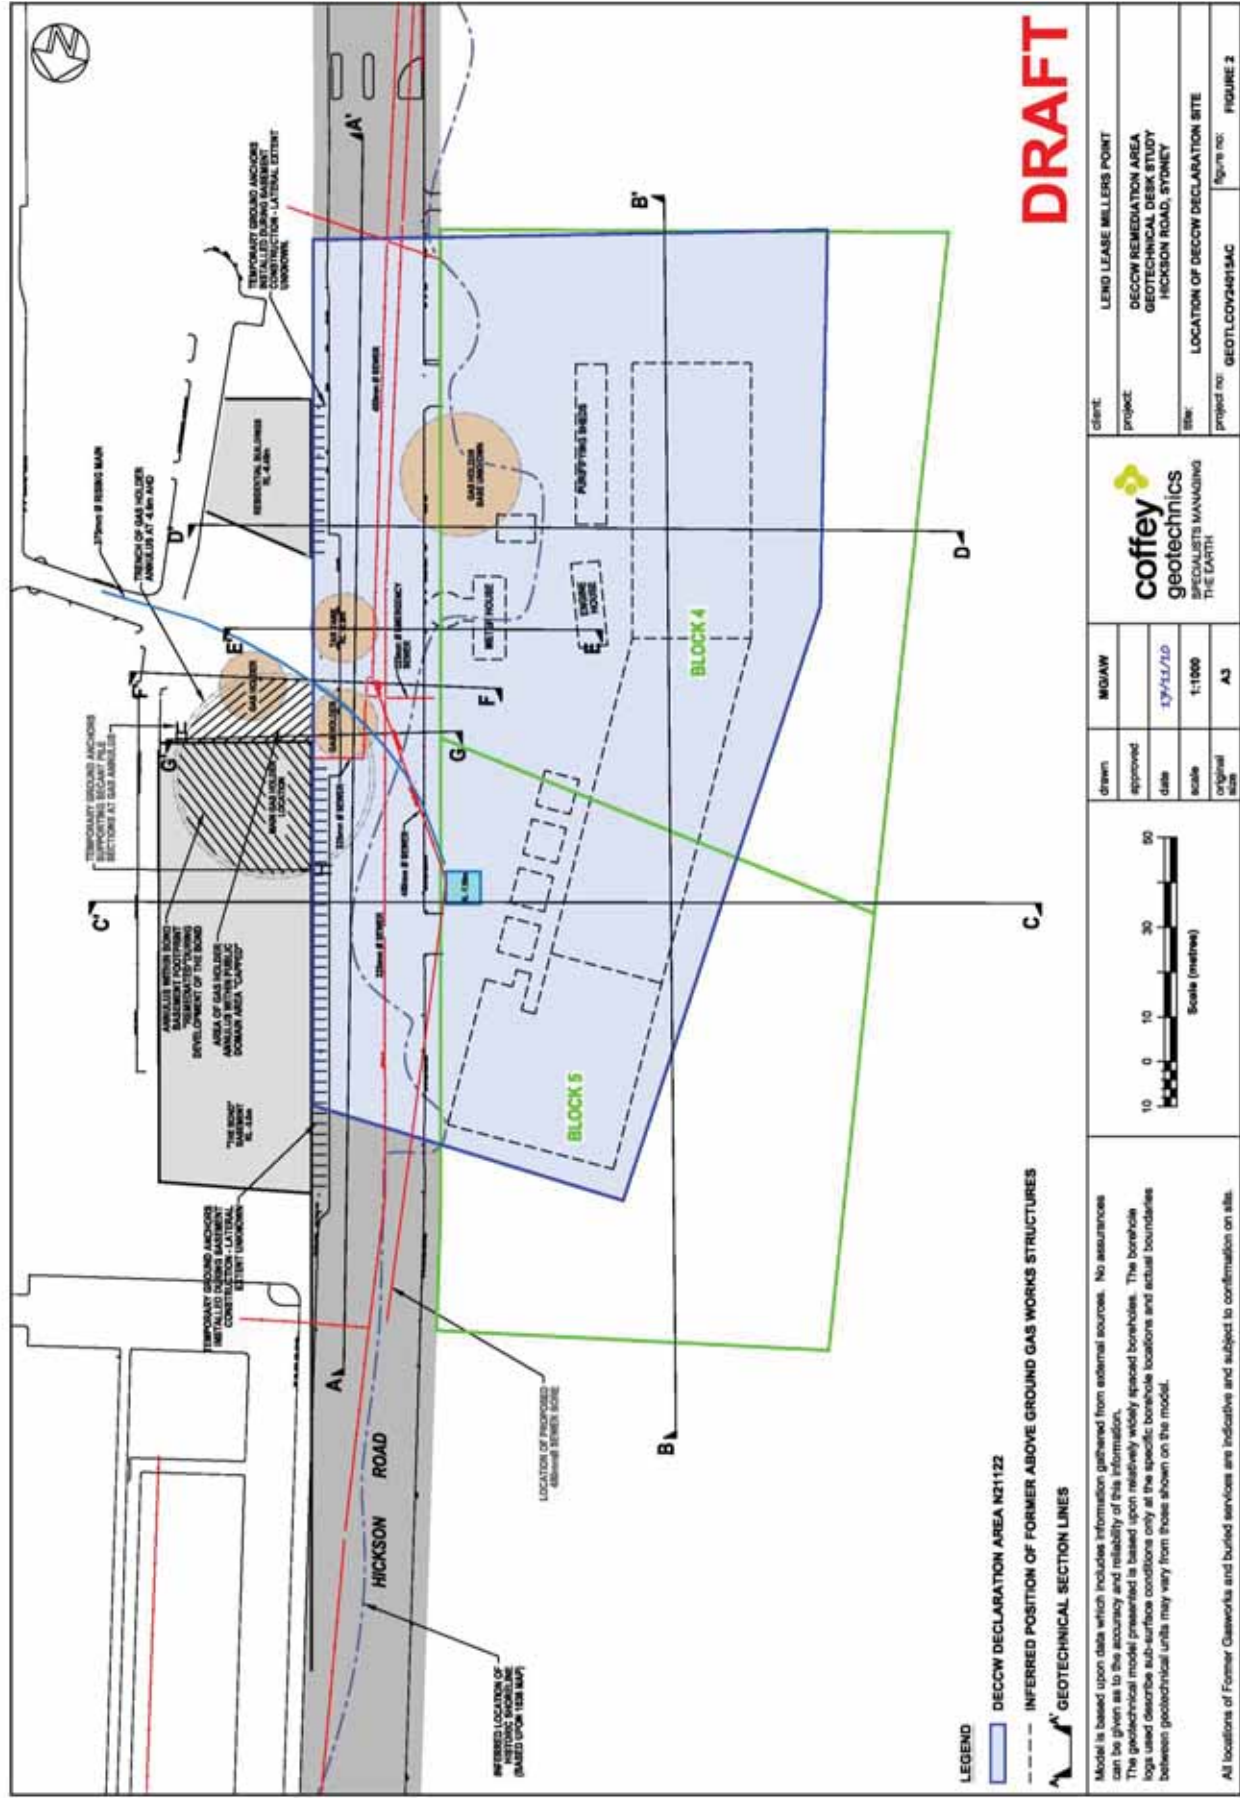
Plan showing the EPA Declaration Area with section lines for geotechnical plans to follow. Coffey Geotechnics
